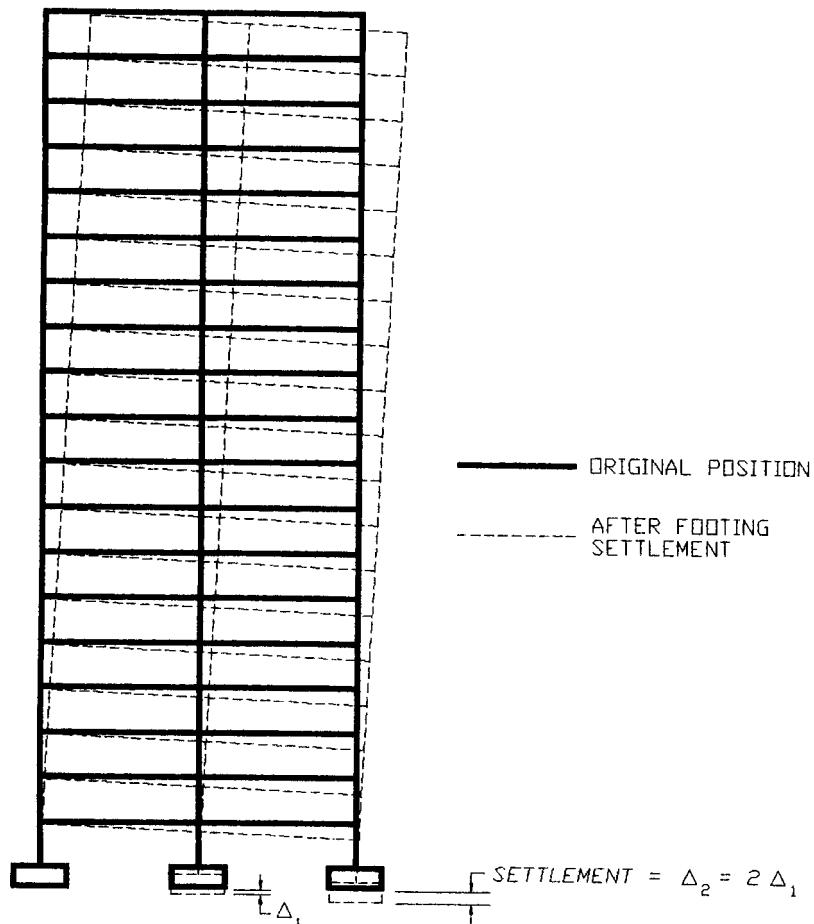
Settlement of center column—high rise—showing effects of settlement of center column telegraphing upwards of the roof of the high-rise structure.
